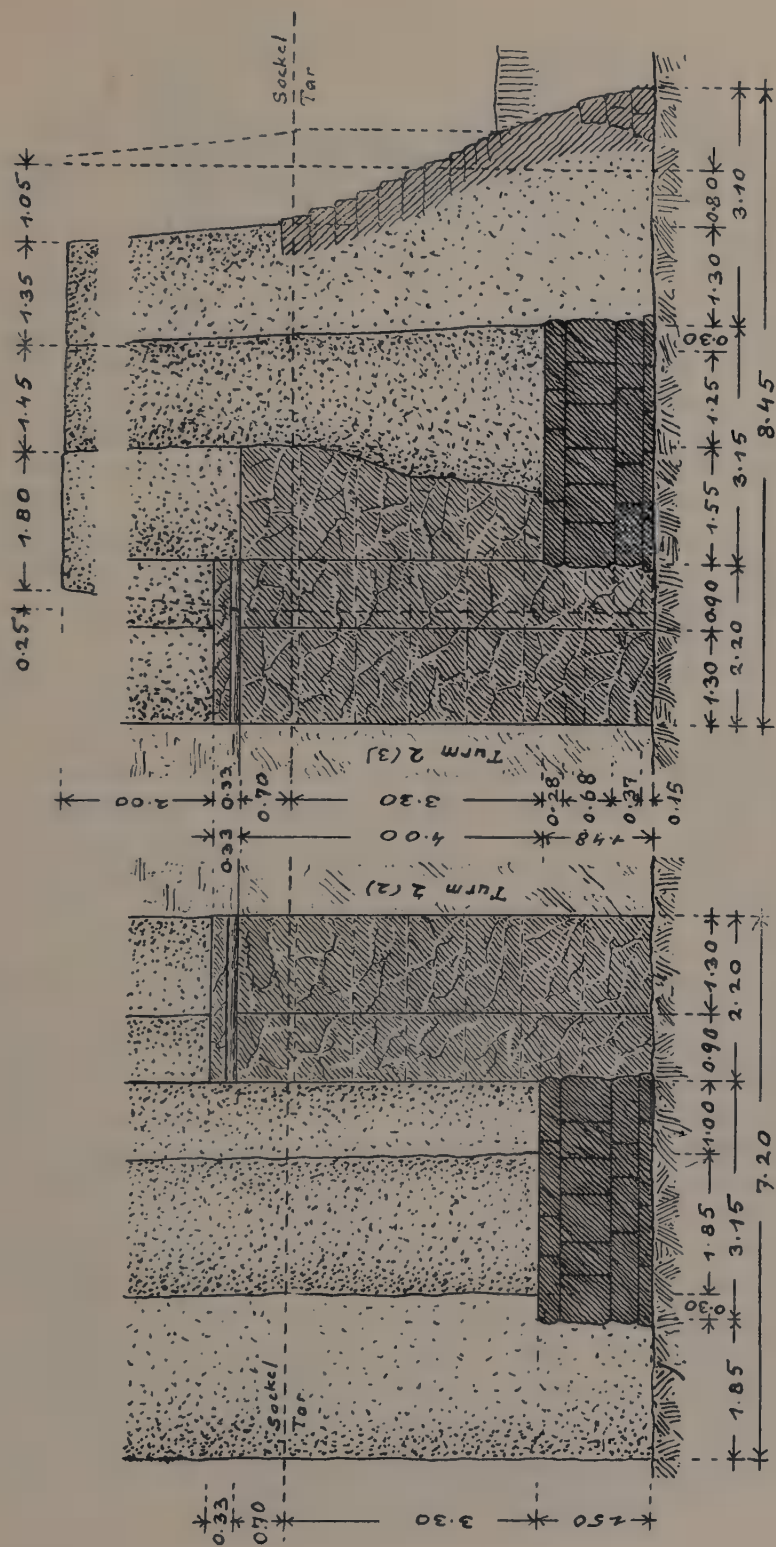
Curtain 25—26. Section Looking North (right) and South (left) from Modern Breach.
